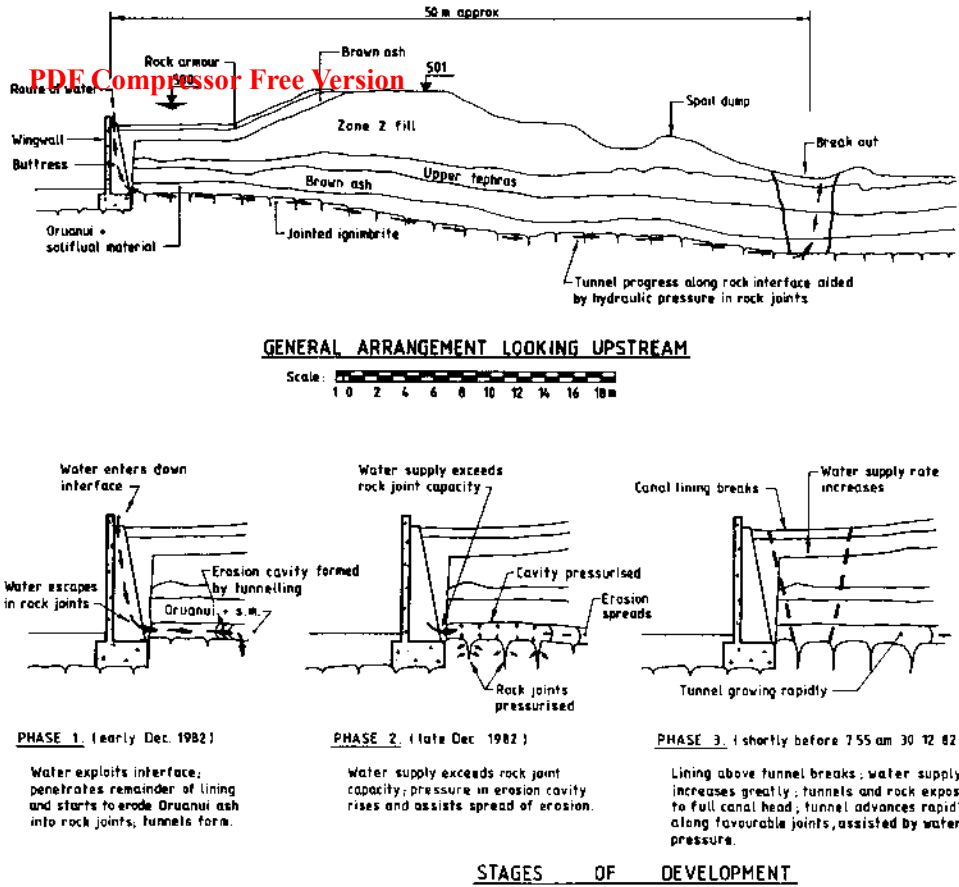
Wheao Canal failure. Diagrams showing the general arrangement and how the failures developed (from Jones 1988).
